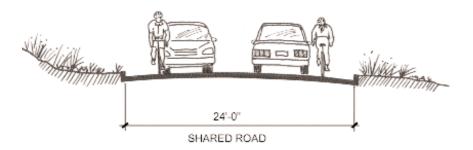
Existing Condition of Juan Bautista de Anza Trail at Battery Caulfield Road
